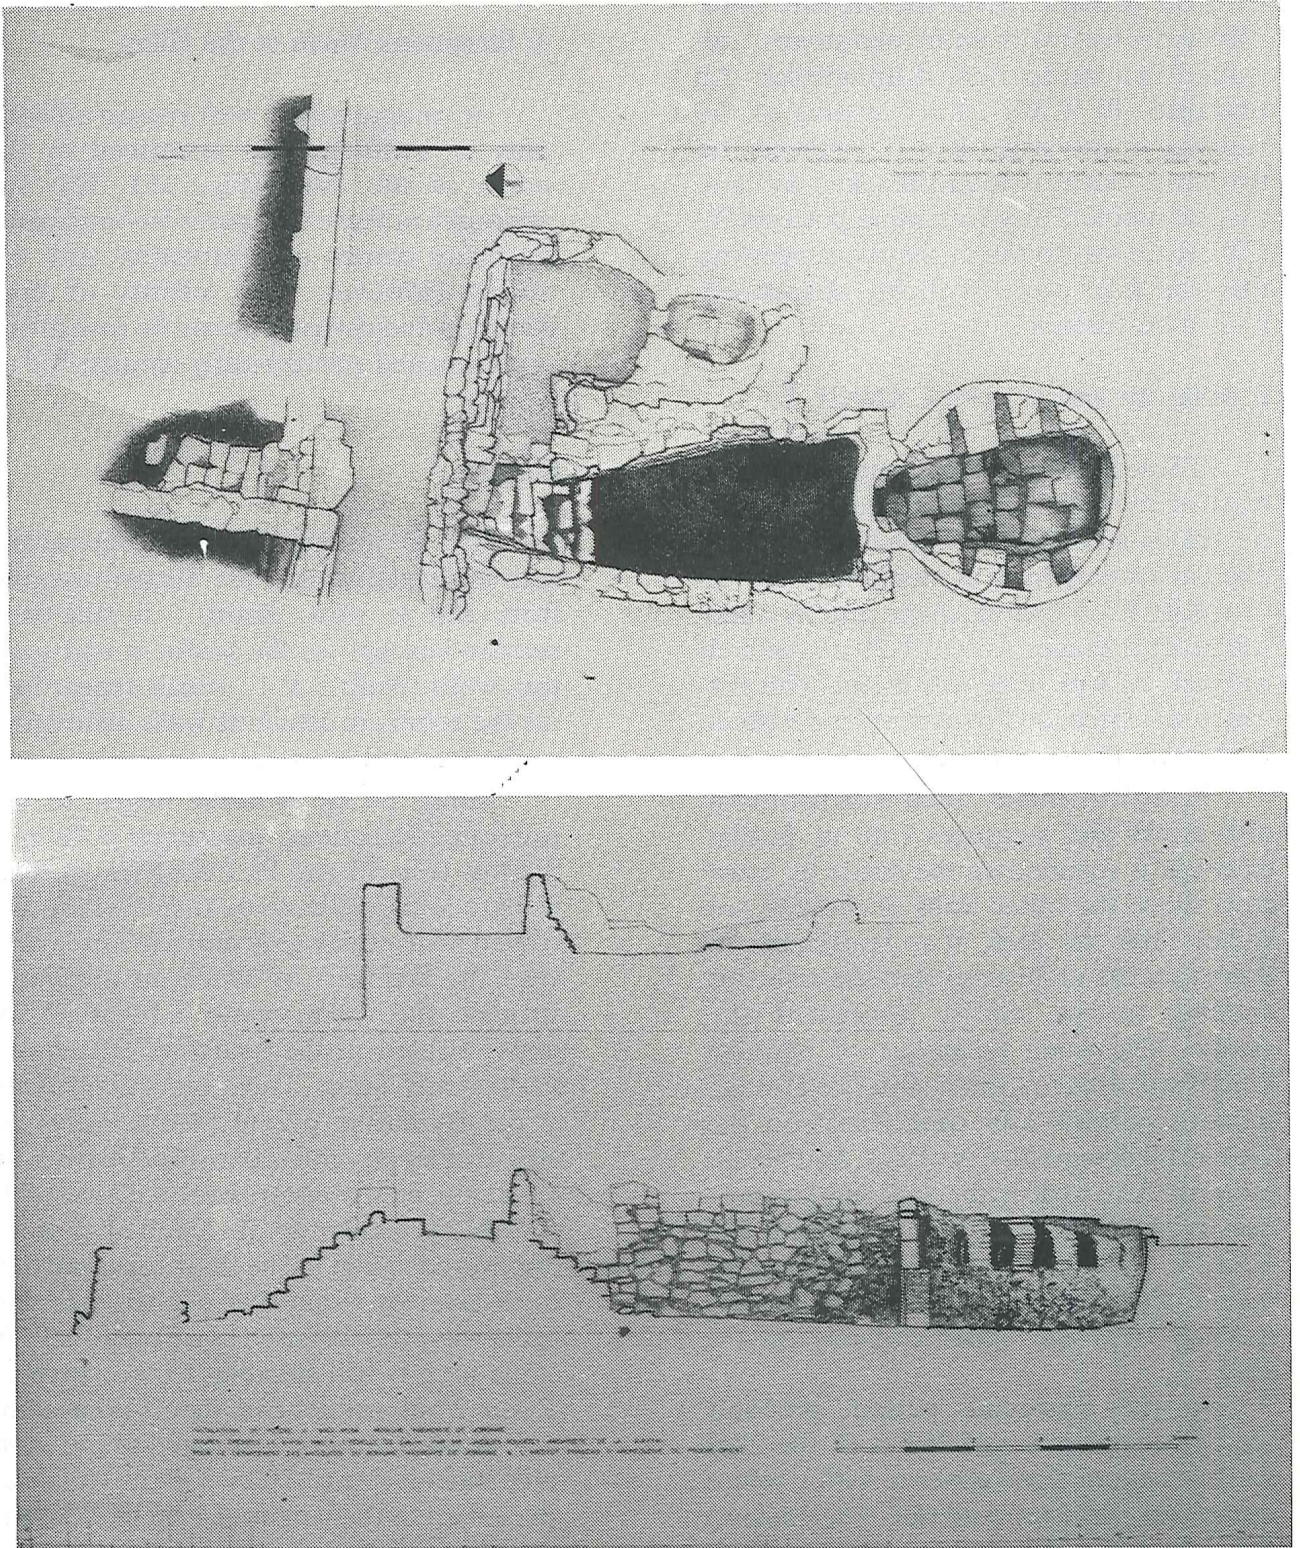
Kilns I-II. Ground plan and section by J. Rougetet.
